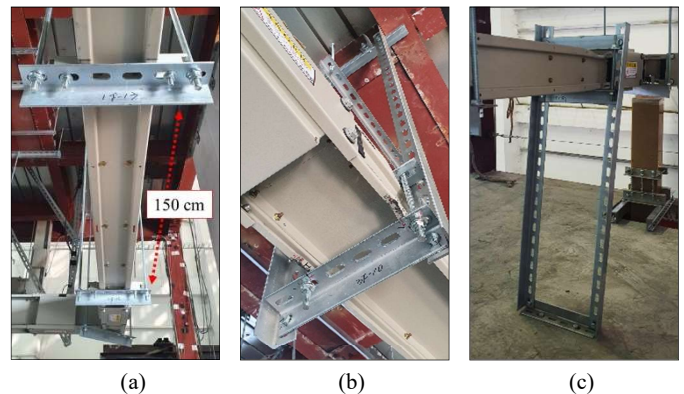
(a) Trapeze systems; (b) suspended braced frame; (c) grounded braced frame
